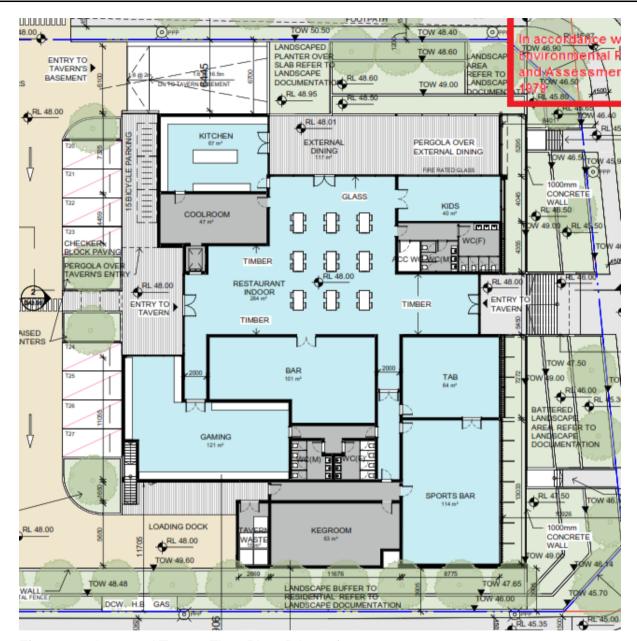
Approved Tavern Floor Plan -DA-698/2019
